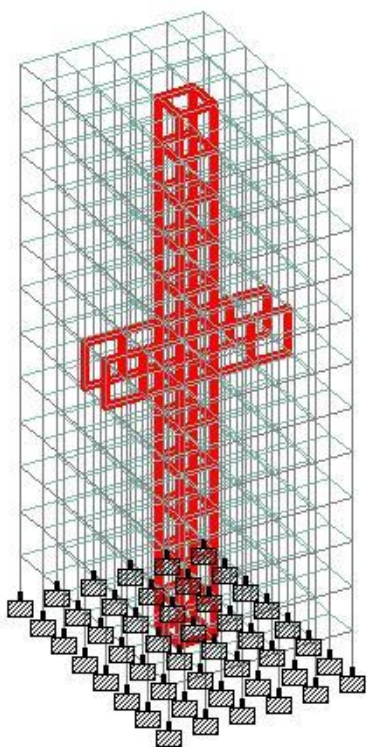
3D view of case (RA3) Residential Apartment with shear core and wall outriggers
